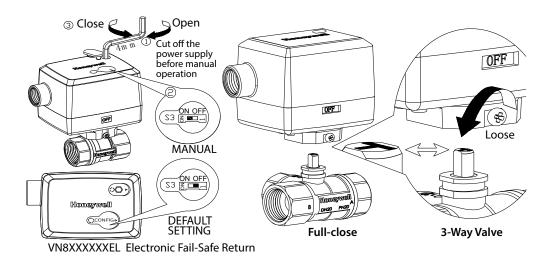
Manual Operation and Stem Position of VN8 Assemblies
